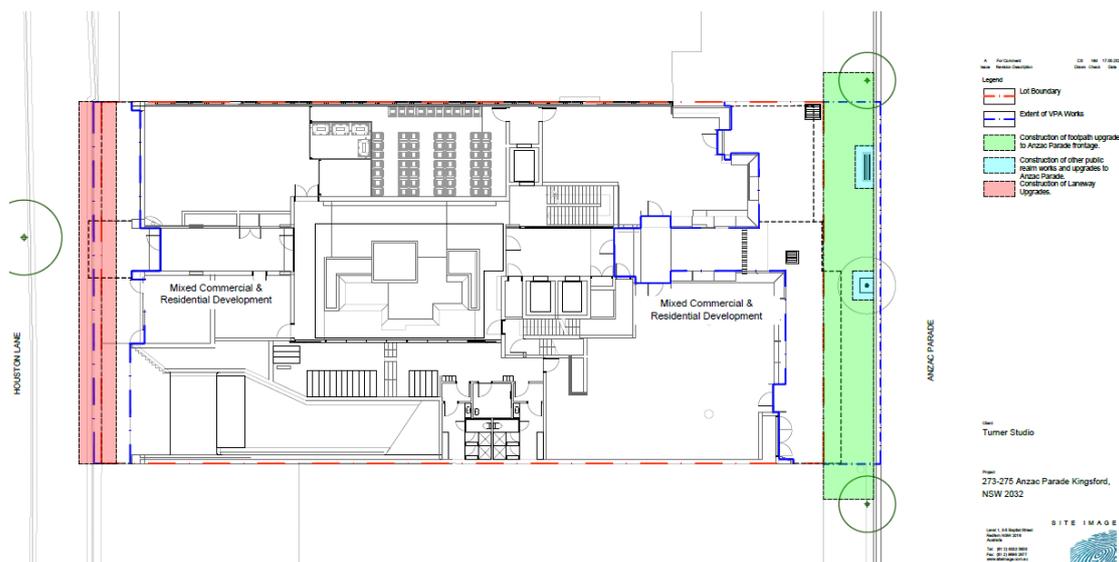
Site plan showing proposed CIC works (Source: Site Image)
